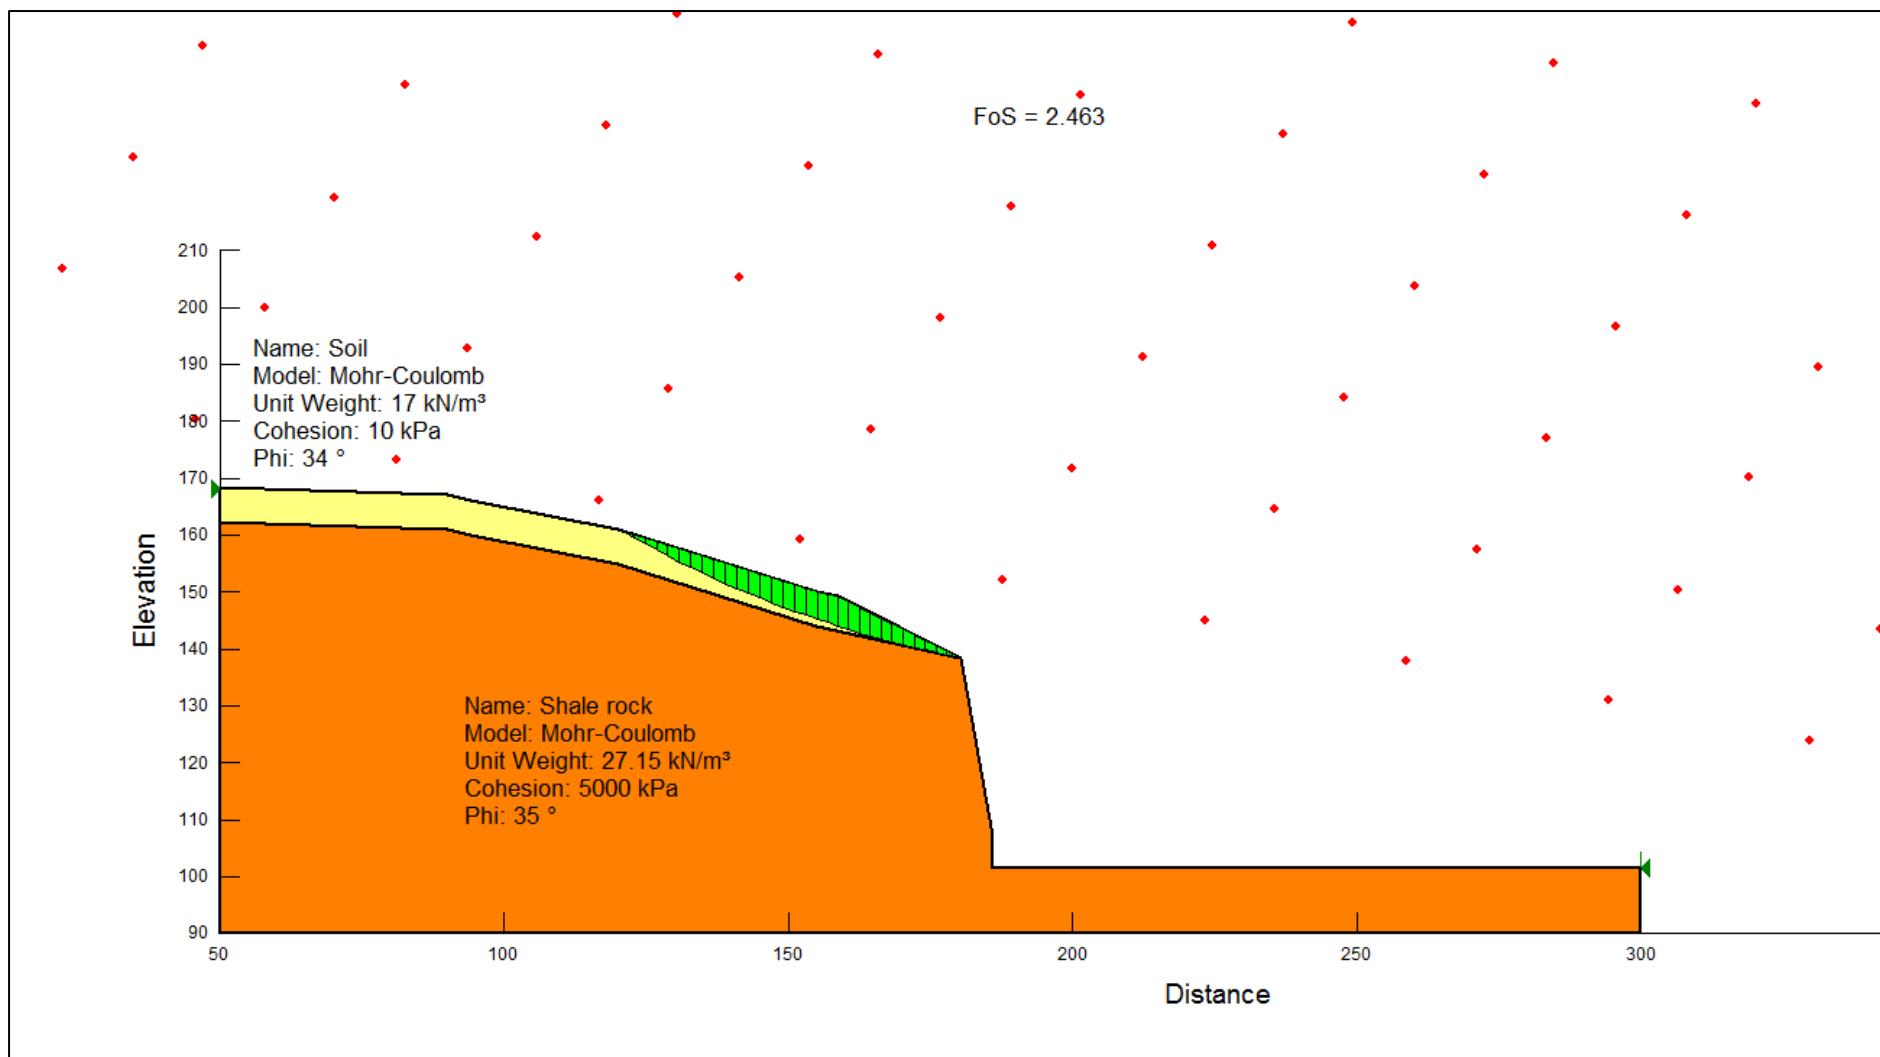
E.22: Outlet portal, Section 2, 1:0.2 excavation slope in shale, 1:2 excavation slope in soil
